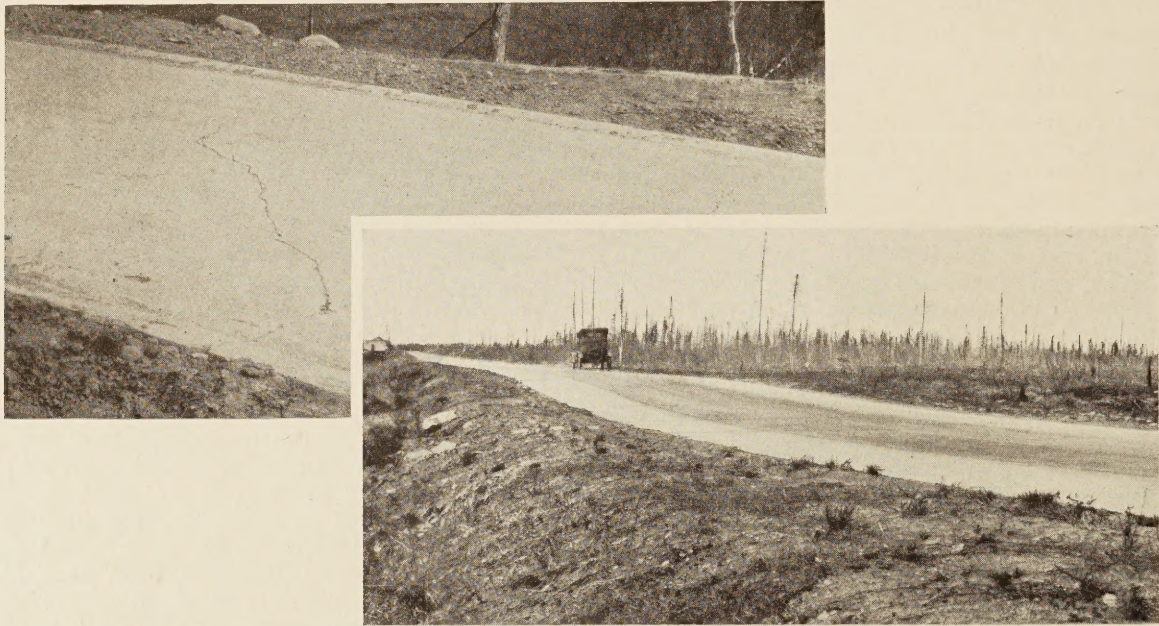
THE UPPER PICTURE SHOWS CRACKS IN CONCRETE ROAD CAUSED BY LACK OF UNIFORMITY IN SUBGRADE SUPPORT. THE LOWER PICTURE SHOWS TRANSVERSE CRACKS AT SHORT INTERVALS DUE TO SUBGRADE SETTLEMENT
